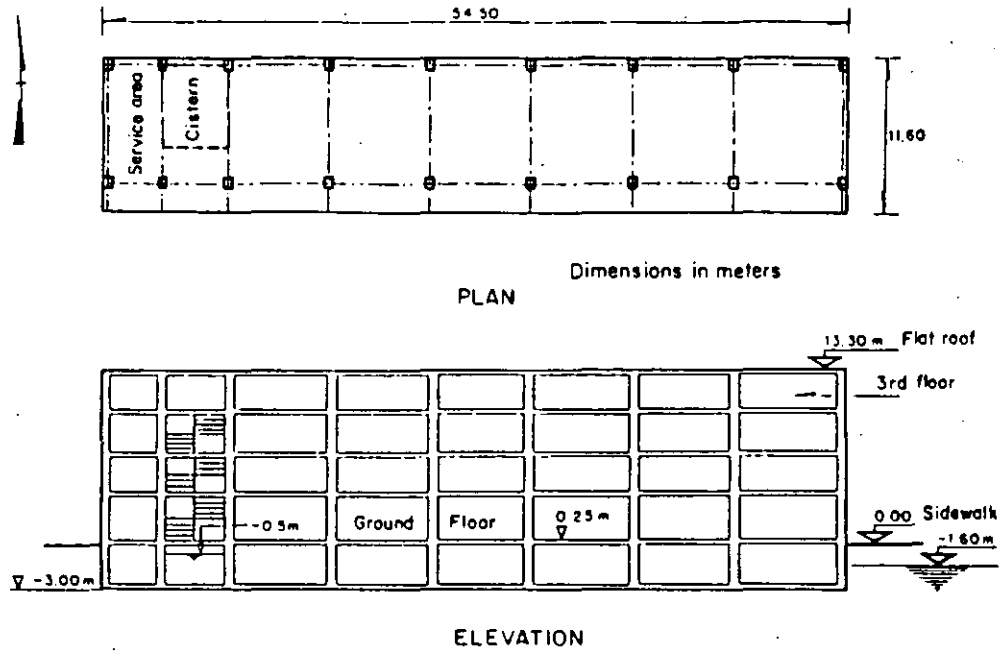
Plan and elevation of school Building II with a partially compensated foundation
